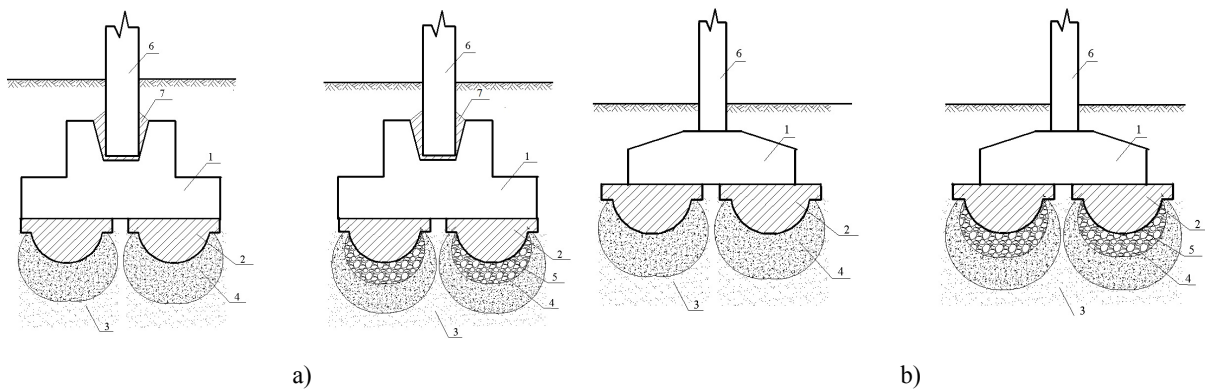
Classical insulated foundations under poles, unloading on punched foundations with or without bulbs (1- classical foundation, 2- semi-sphere with anti-pressing plate, 3 – natural soil, 4 – improved soil, 5 - bulb, 6 - pole, 7 - monolith): a) glass foundations; b) elastic foundations
